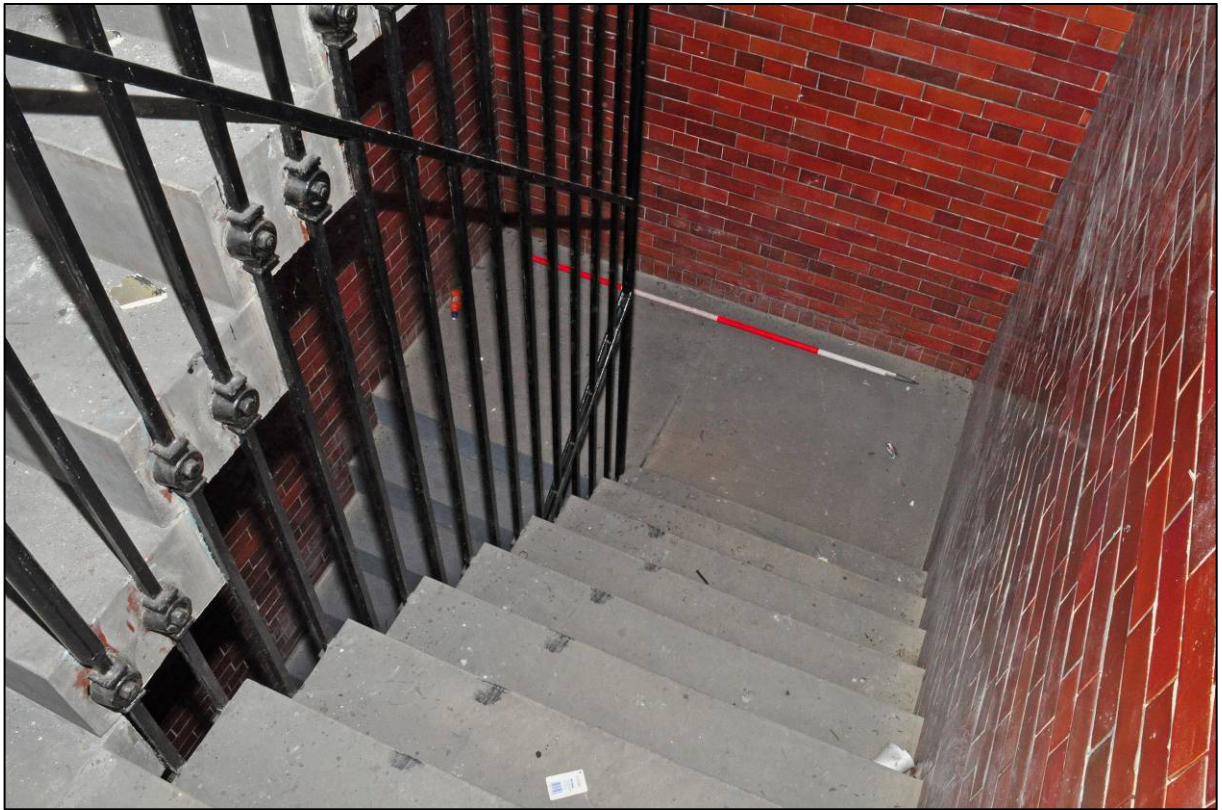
1908 Higher Grade Girls' School, stair tower (1F26), looking N (photo 2368).
